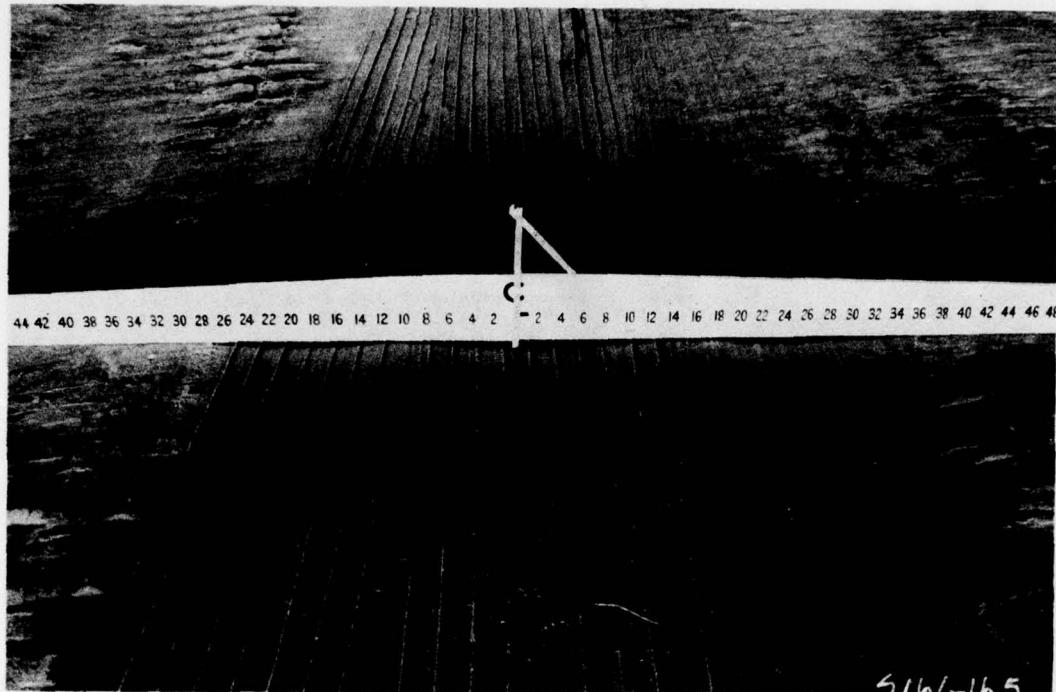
Test Section No. 5, item 4, after C-130 traffic
